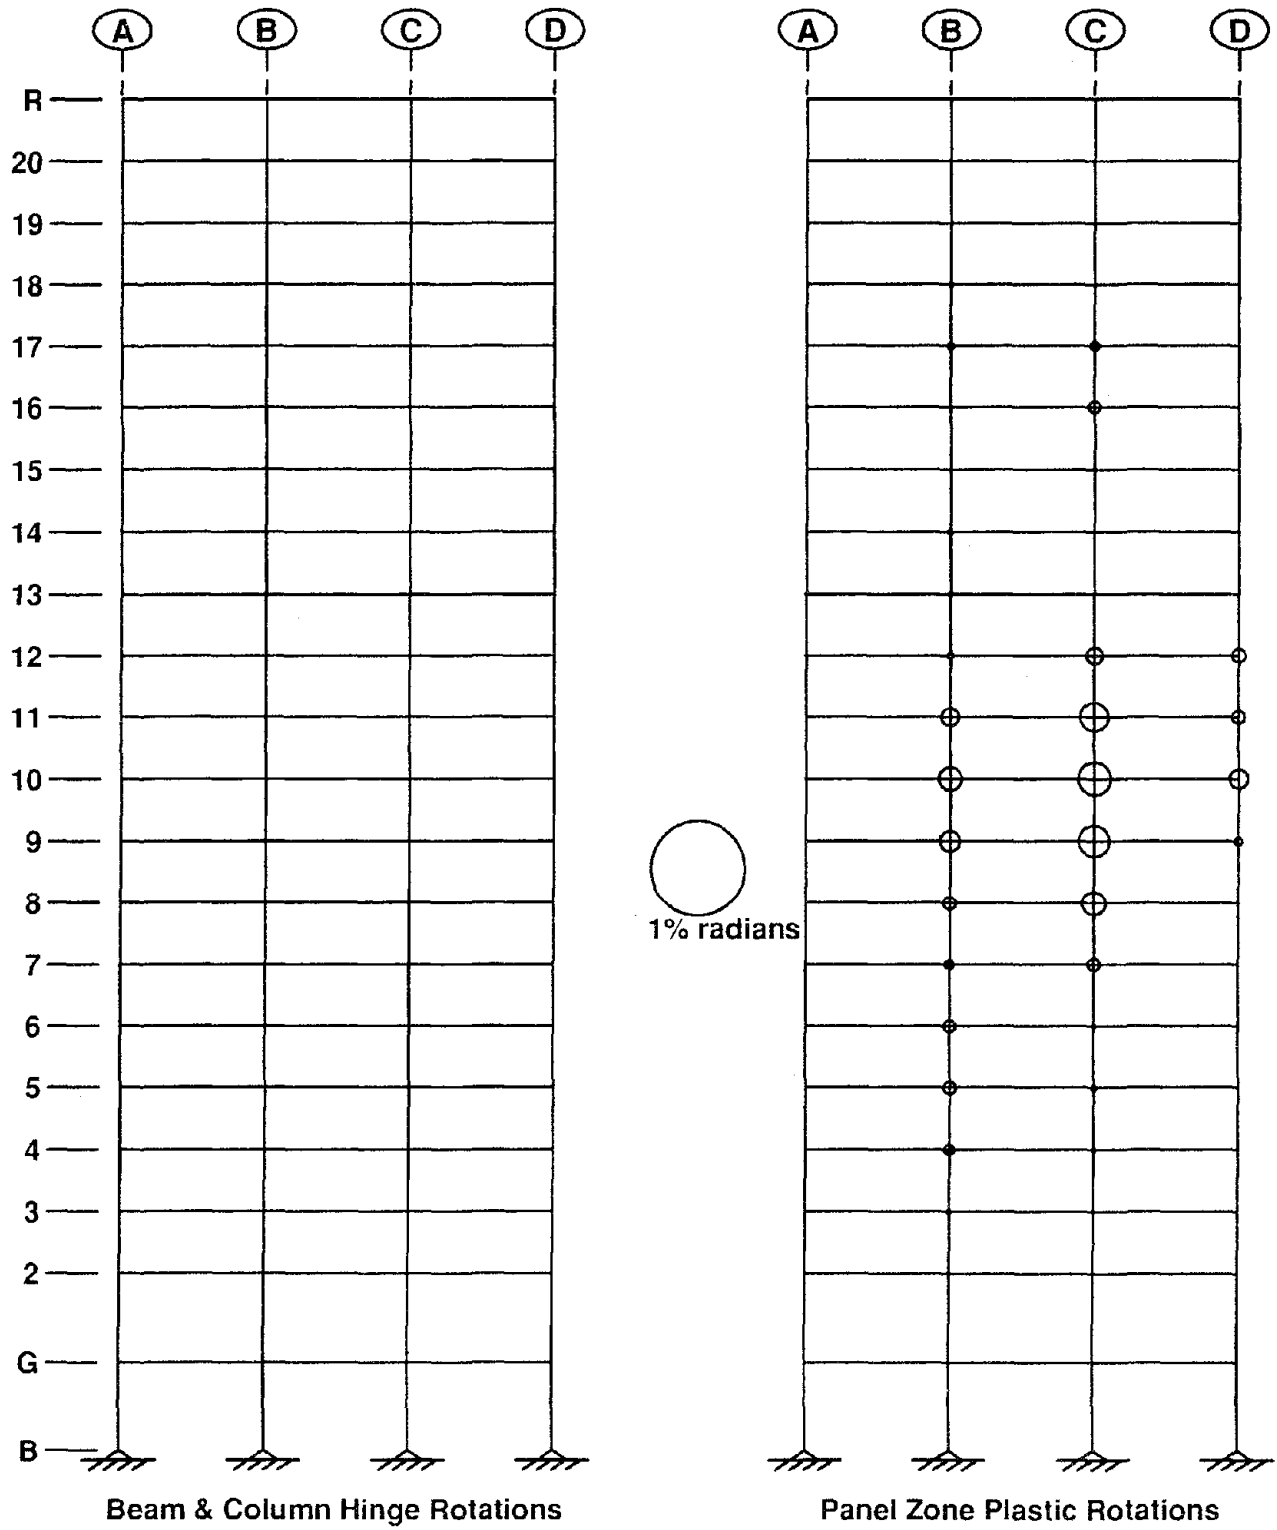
Maximum Beam, Column and Panel Zone Joint Plastic Rotations for MRF Design 3
